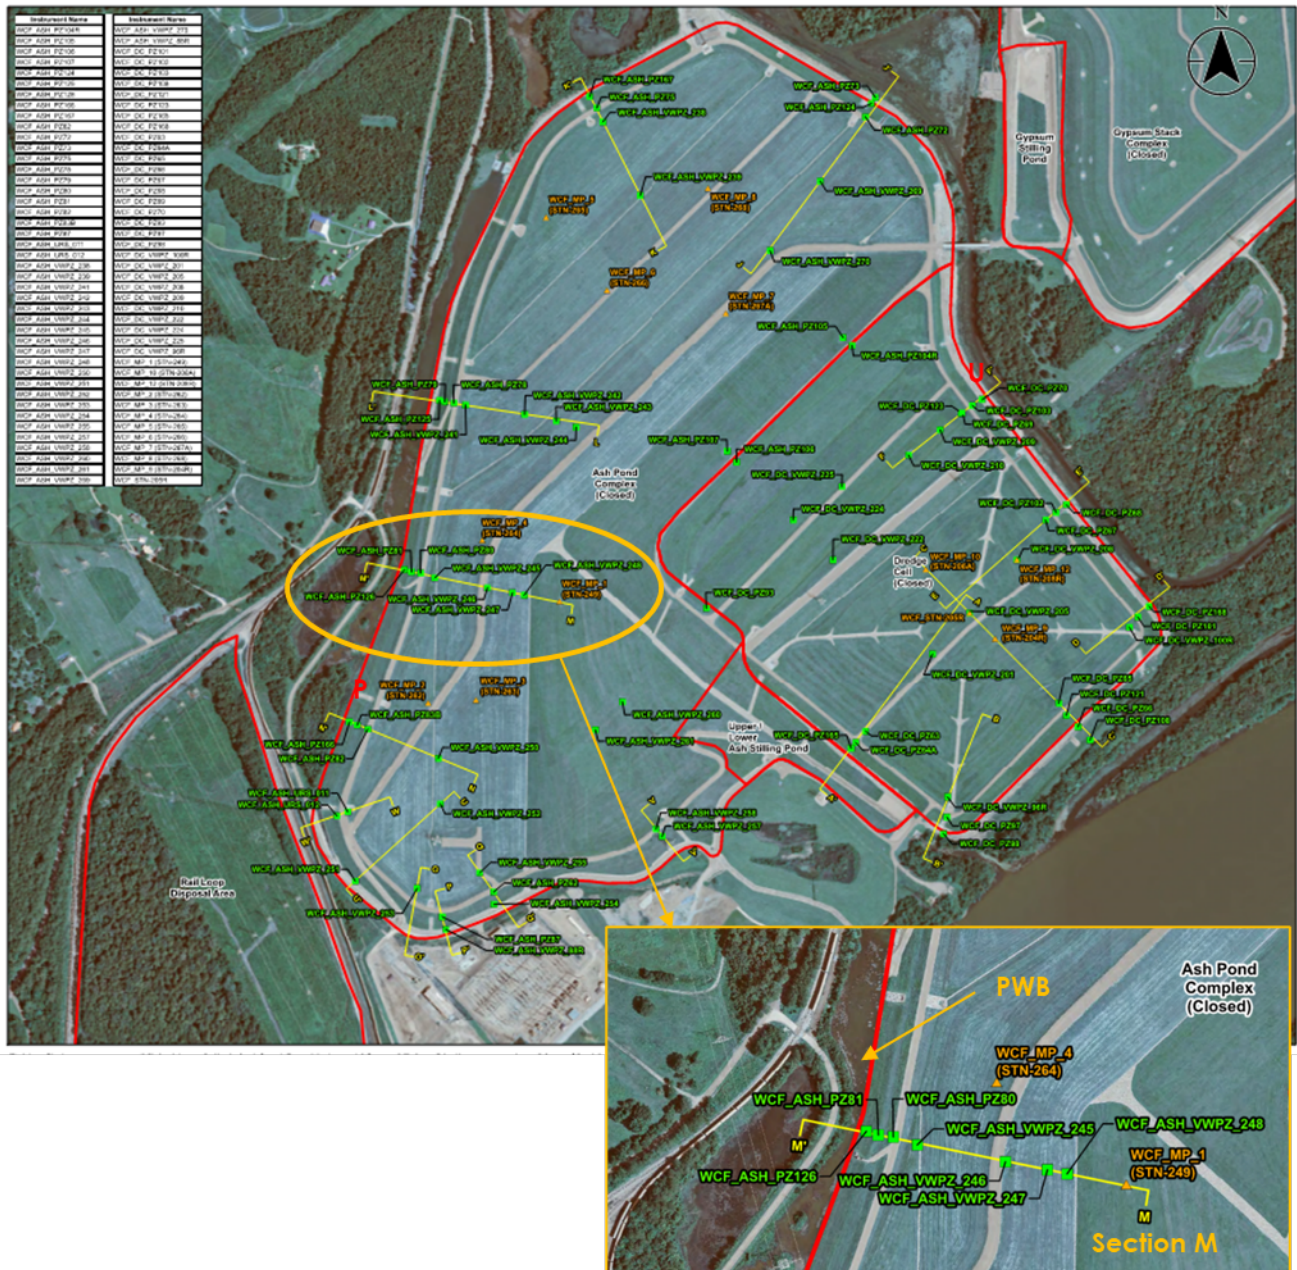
WCF Ash Pond Complex – Plan View of Cross Sections
